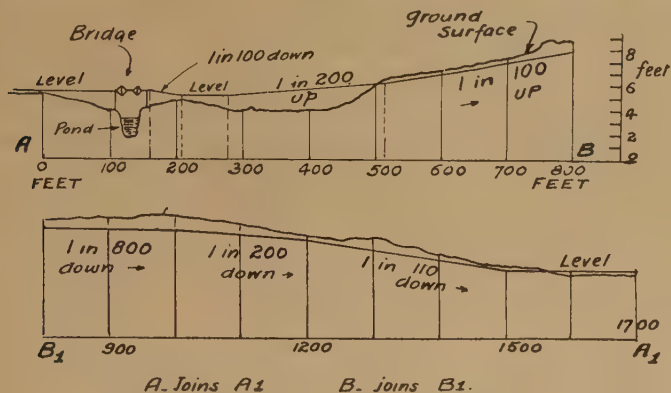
Typical Profile Plan for Large Outdoor Railway
